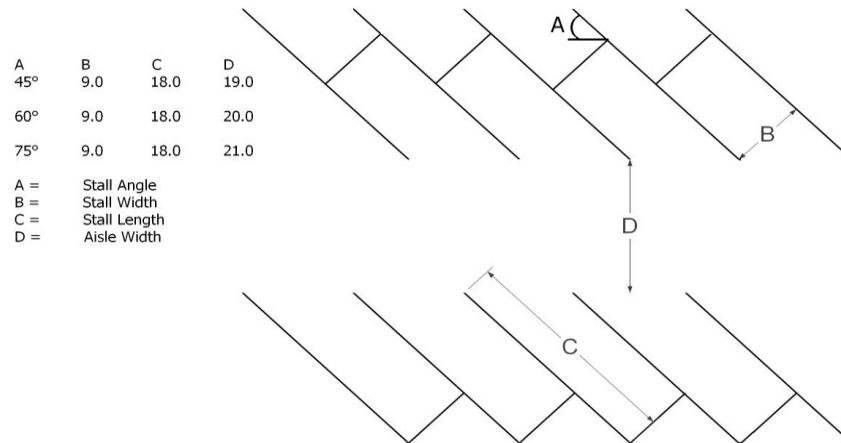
Parking layout dimensions for 9.0' stall widths at various angles with two-way aisles (minimum standards)
